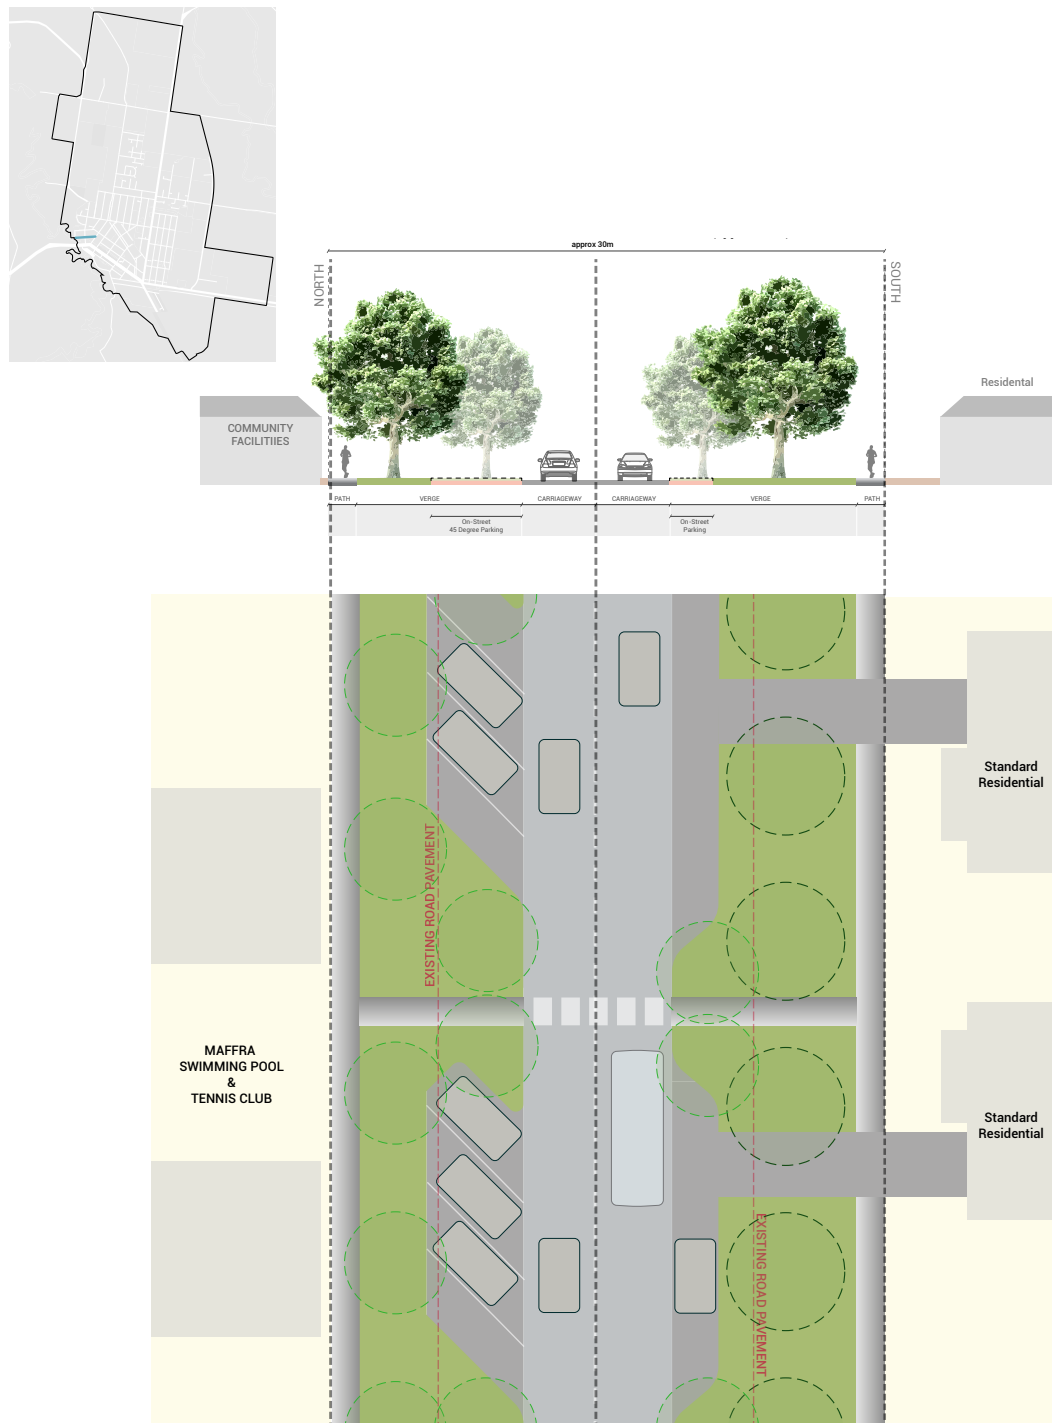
Reduced Pavement Diagram – Duke Street Cross Section – between River St & McMillan St
